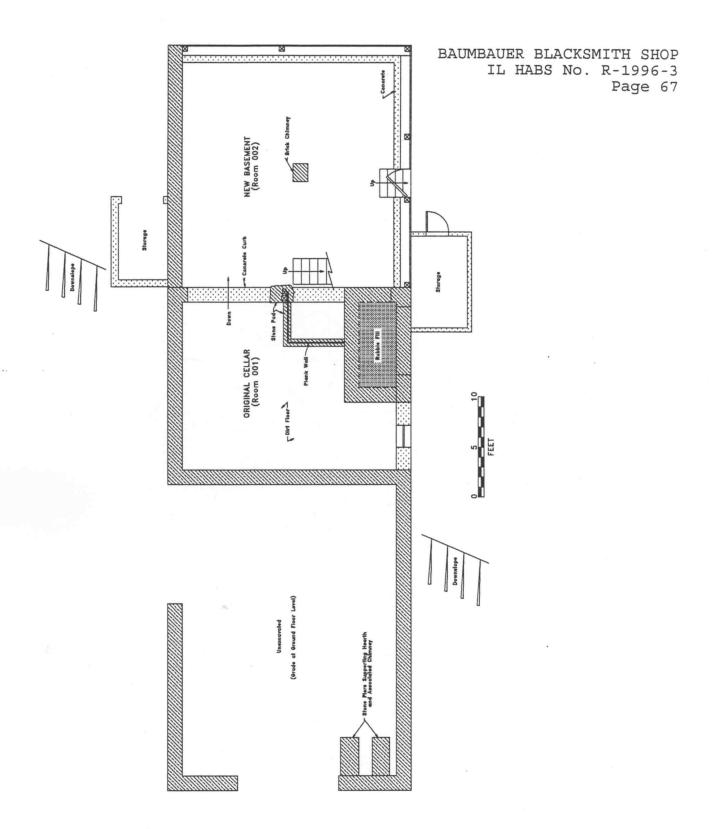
Basement and foundation plan of Baumbauer Blacksmith Shop, 1995.
